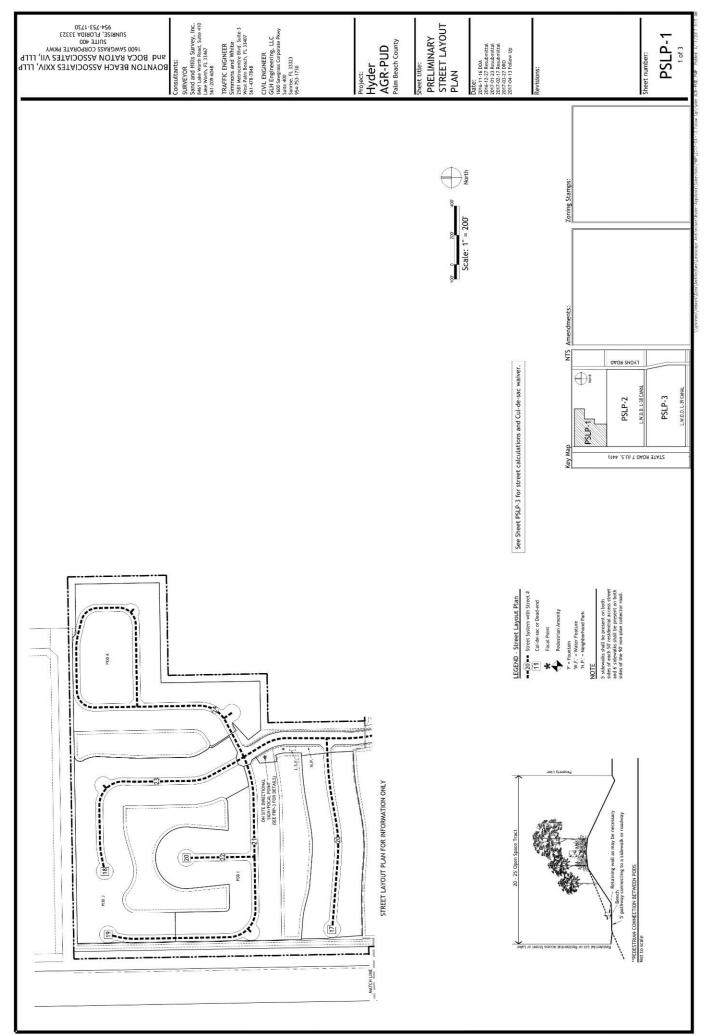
Preliminary Street Layout Plan dated April 13, 2017 (Sheet 1 of 3)
